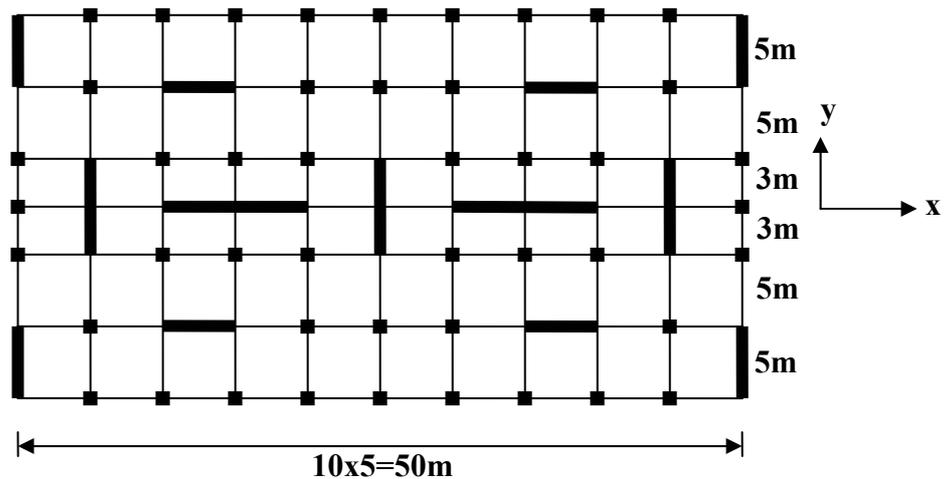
Arrangements of Shear Walls for the 3-D Building Studied
